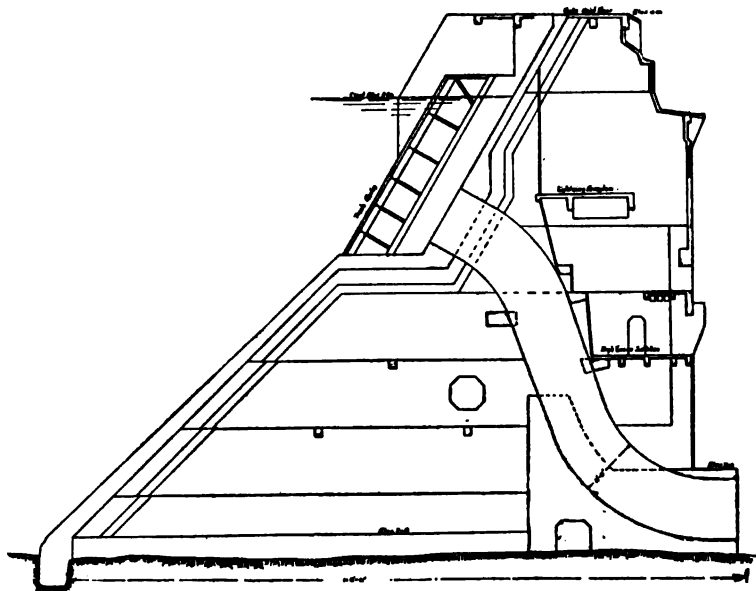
SECTION OF DAM THROUGH INTAKE.
